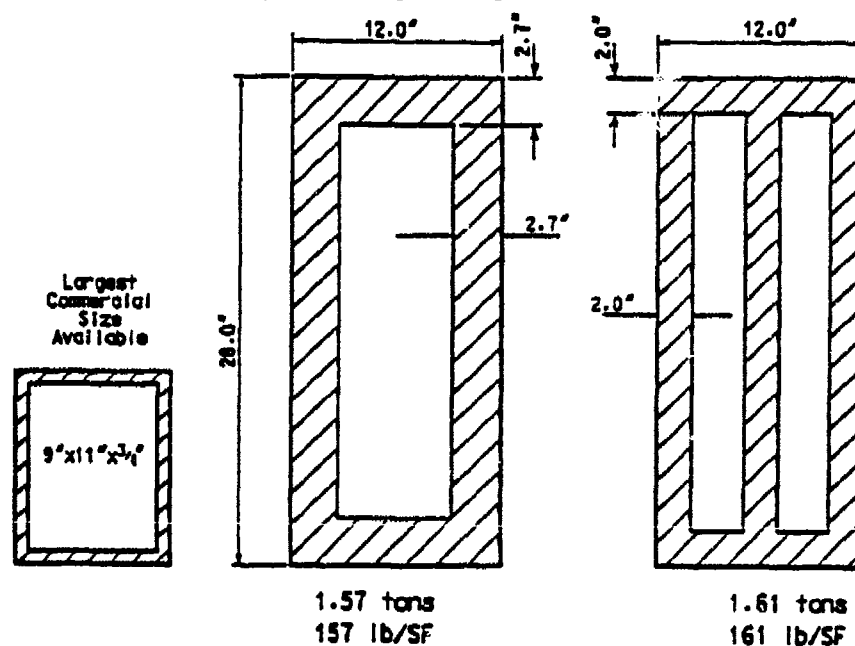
Pultruded Fiberglass Beam Designs for 20-Foot Roof Span.
